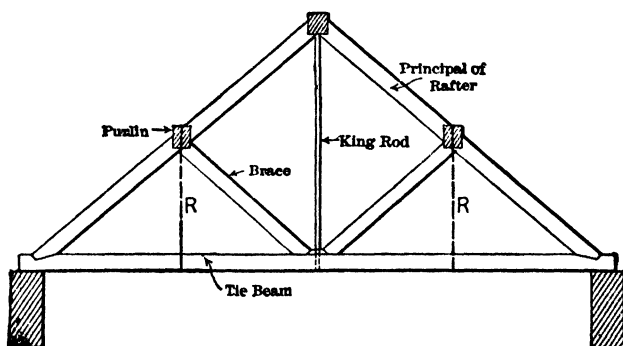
King-rod Truss. Spans up to Thirty-six Feet
